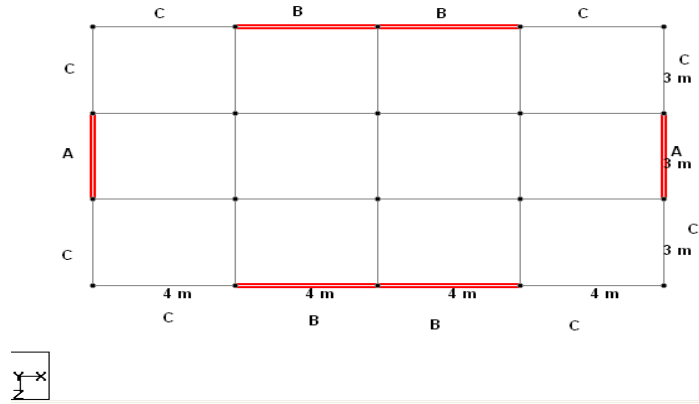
Plan of building showing location of braced frame and shear wall frame (Patil .S. S et al (2013))
